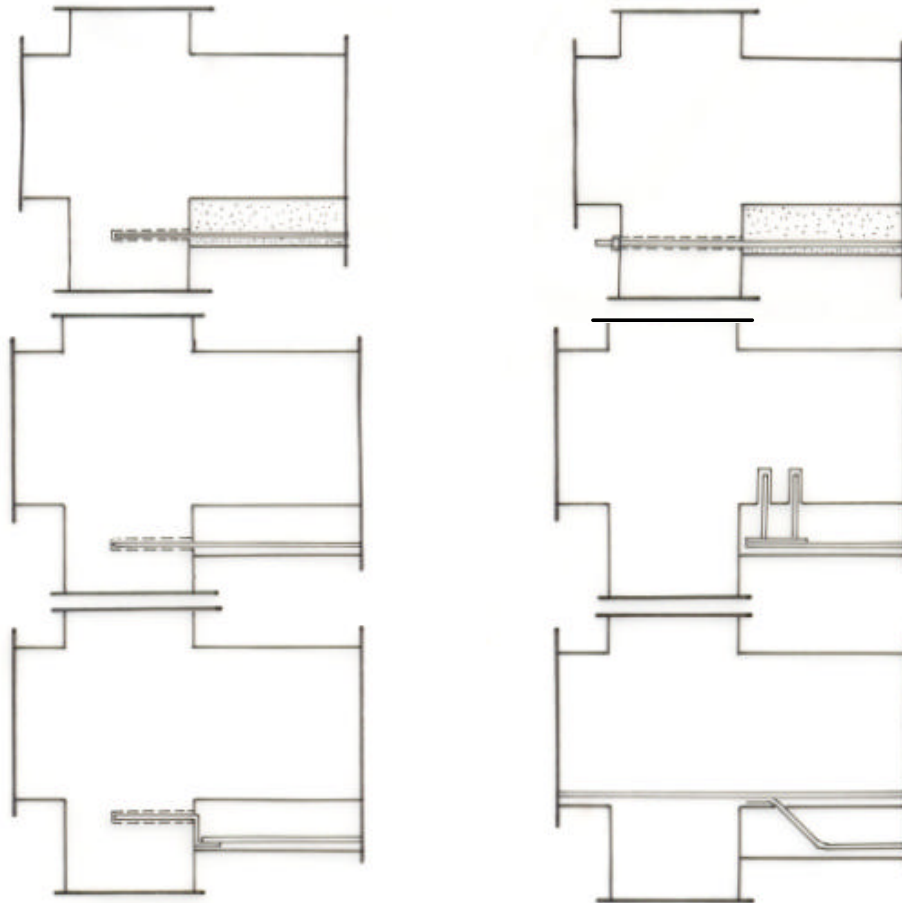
Anchorage types for longitudinal reinforcements in beam strengthening [46]
